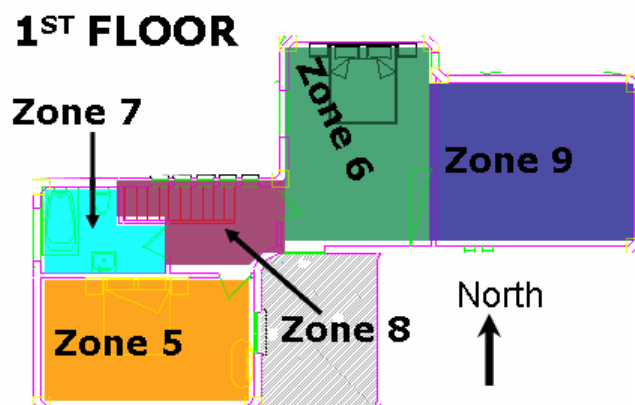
Ground plan and orientation of the residential building's 1st floor.
